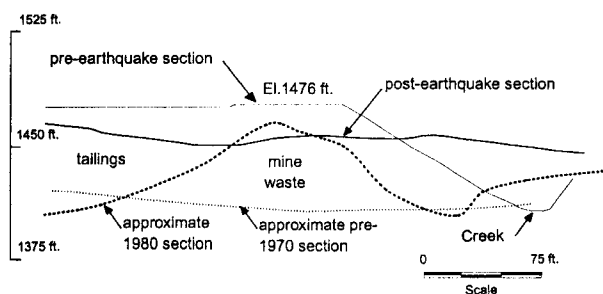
Section B-B from Fig. 4, Showing Failed Embankment Section Northwest of Breach
